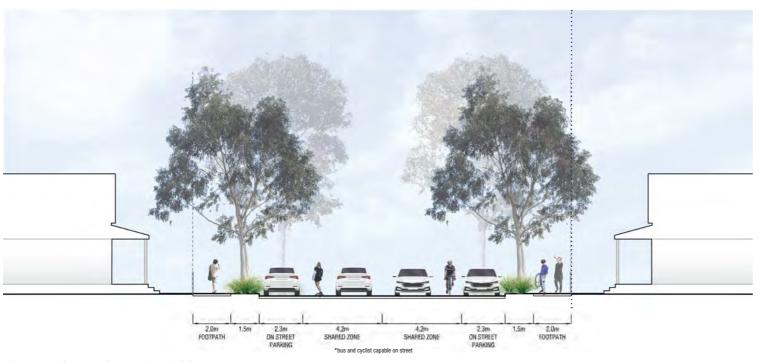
| Clarkefield Township Zone - Traffic Management Plan
